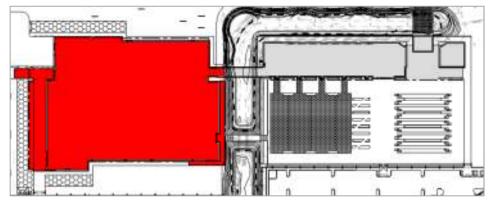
Start of Construction Process of West Campus Central Utility Plant and Physical Plant
